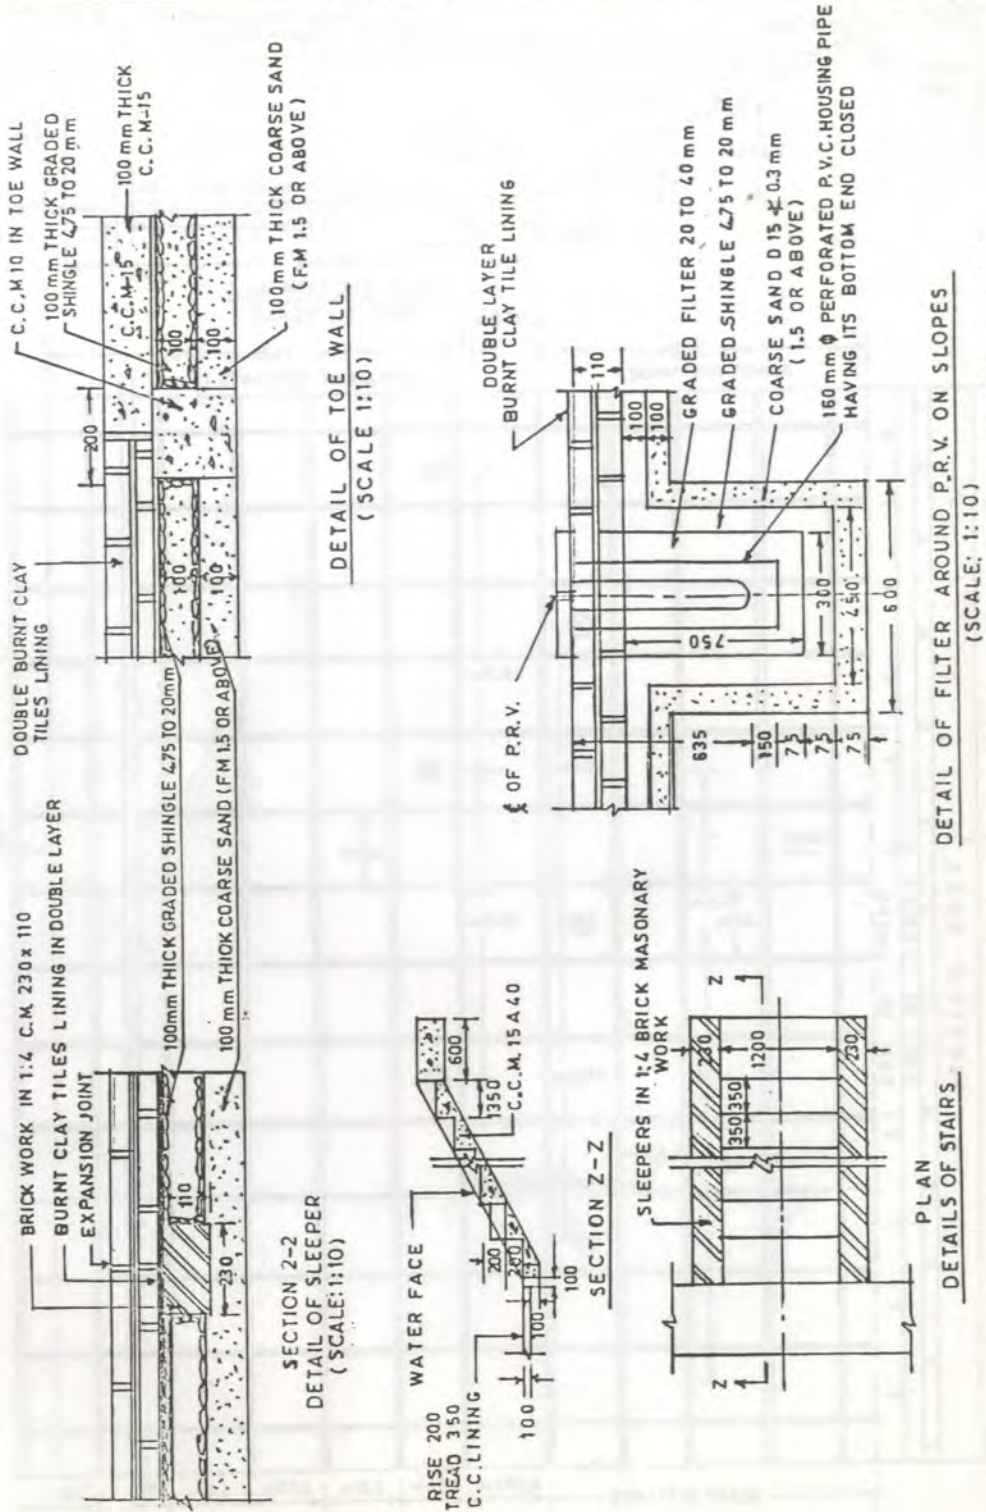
(d) DETAILS OF SLEEPER TOE WALL STAIRS, P.R.V. ON SLOPE OF PUG C
